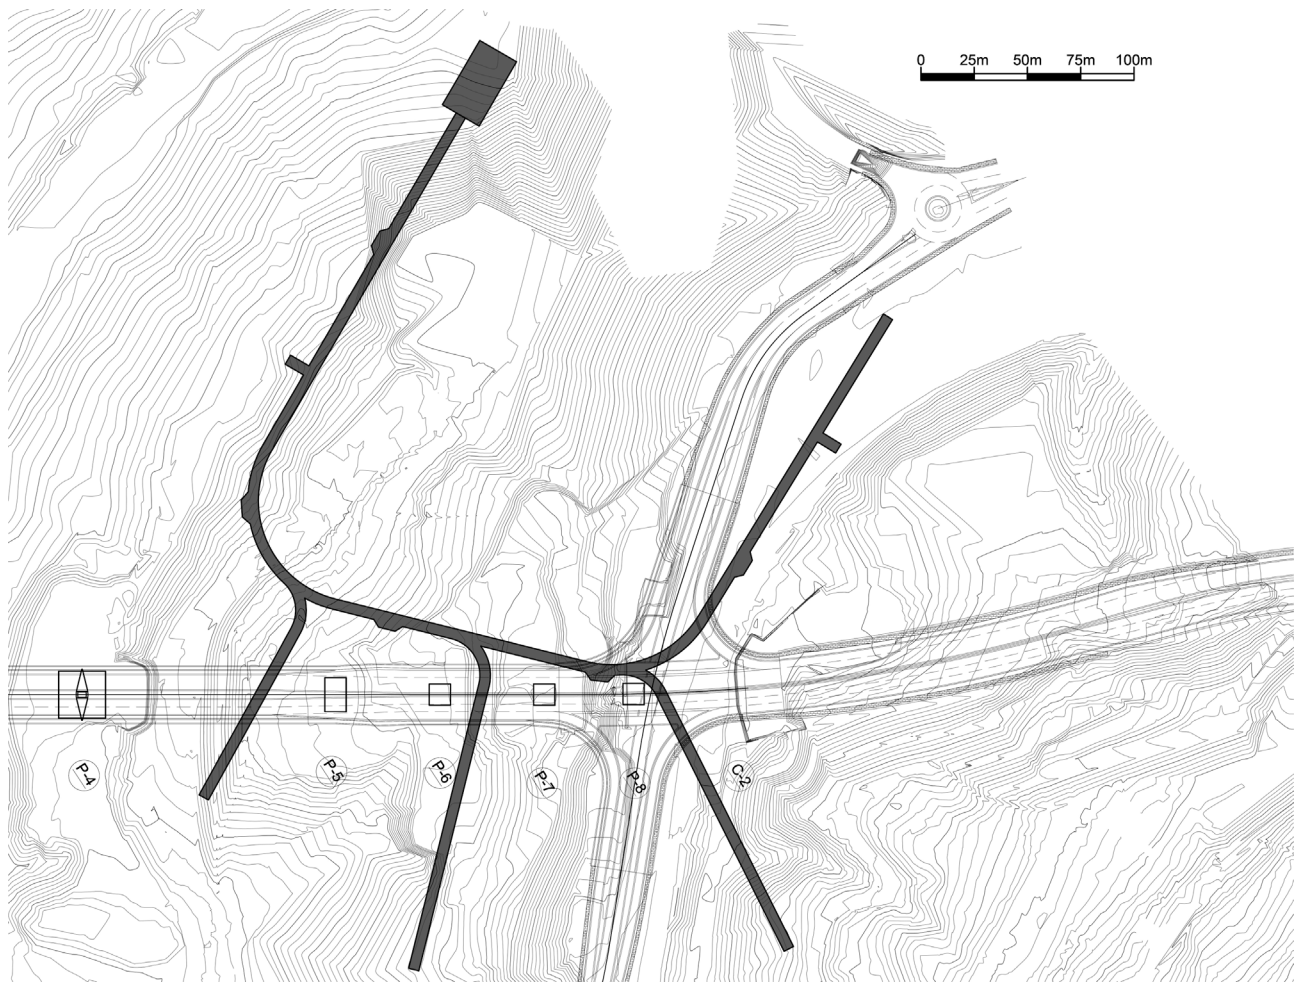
Plan view of main tunnel and adits, as well as location of bridge foundations.
